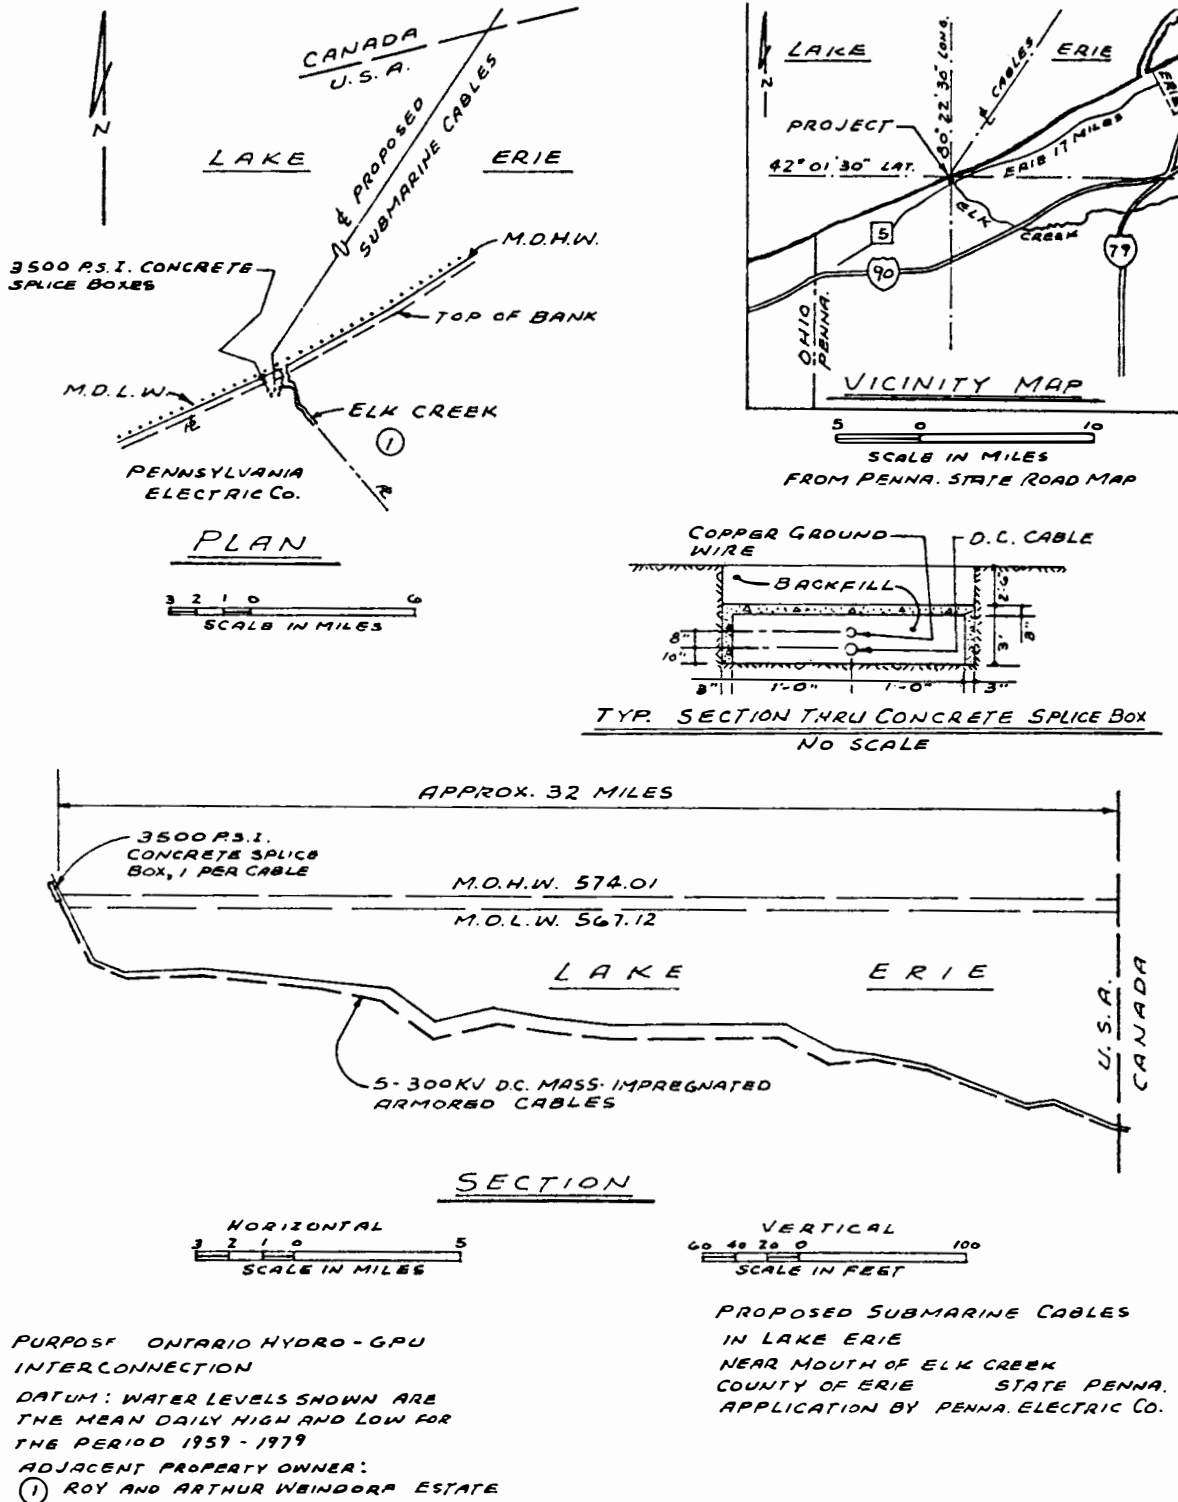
Plan and Profile of Submarine Cables in Lake Erie. From GPU 1981b.
